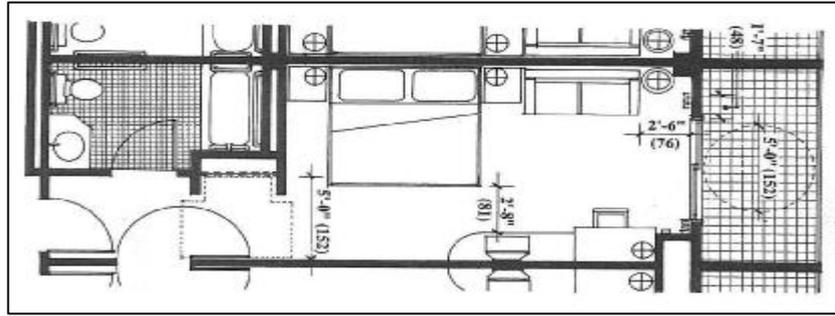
Accessible hotel guestroom plans with 3.66 m bay spacing. (DECHIARA, 1991, 377).
